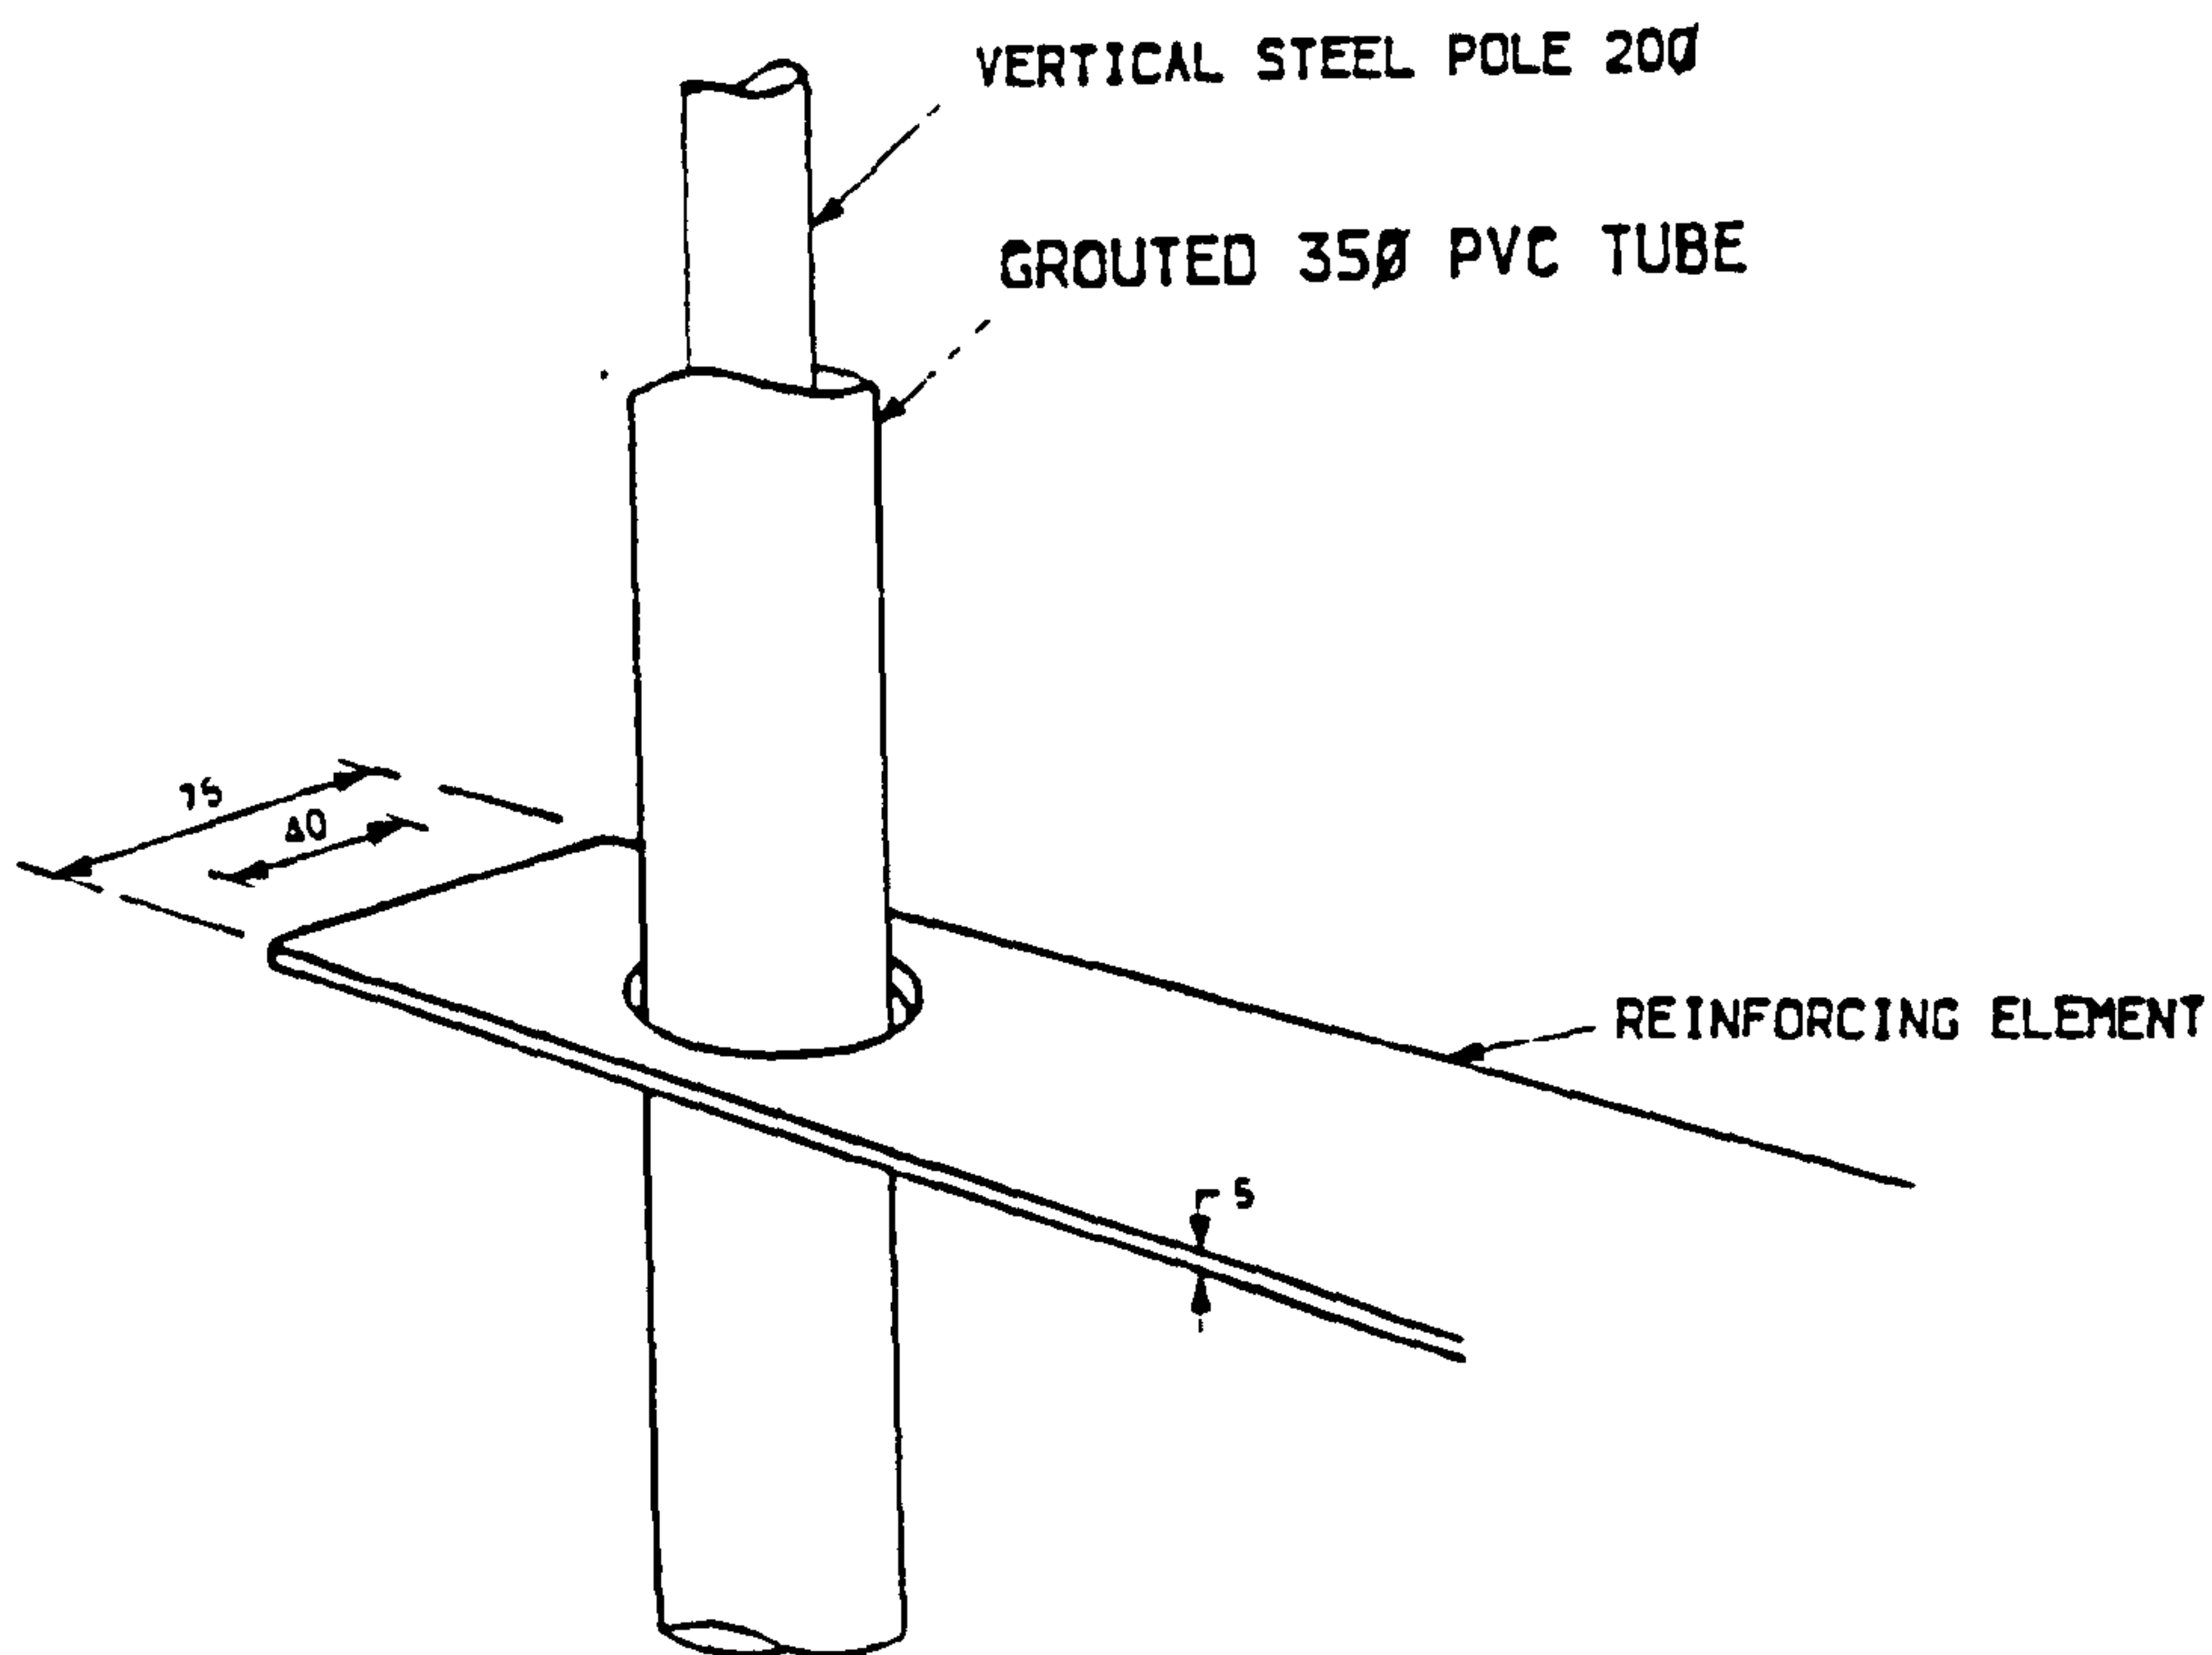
32. A) CONNECTION BETWEEN THE REINFORCING ELEMENT AND THE WALL FACE (AFTER HOLLINGHURST AND MURRAY, 1988).
